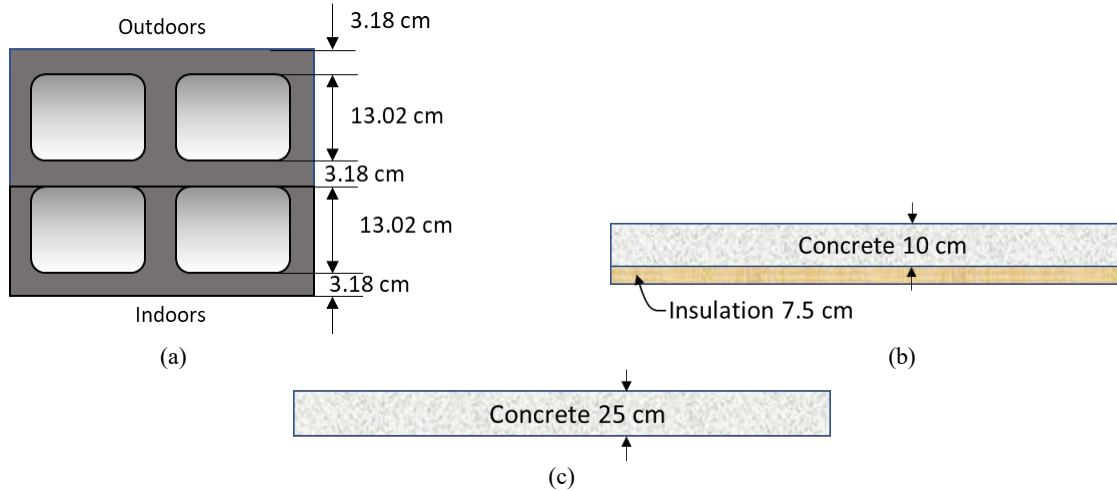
Building envelope details of (a) vertical walls, (b) Roof and (c) ground floor.
